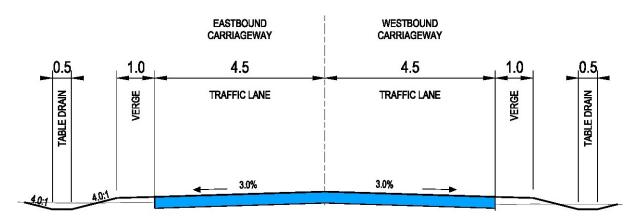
Typical cross section – New link road (western section) between Denmark Road and Carlton Street
